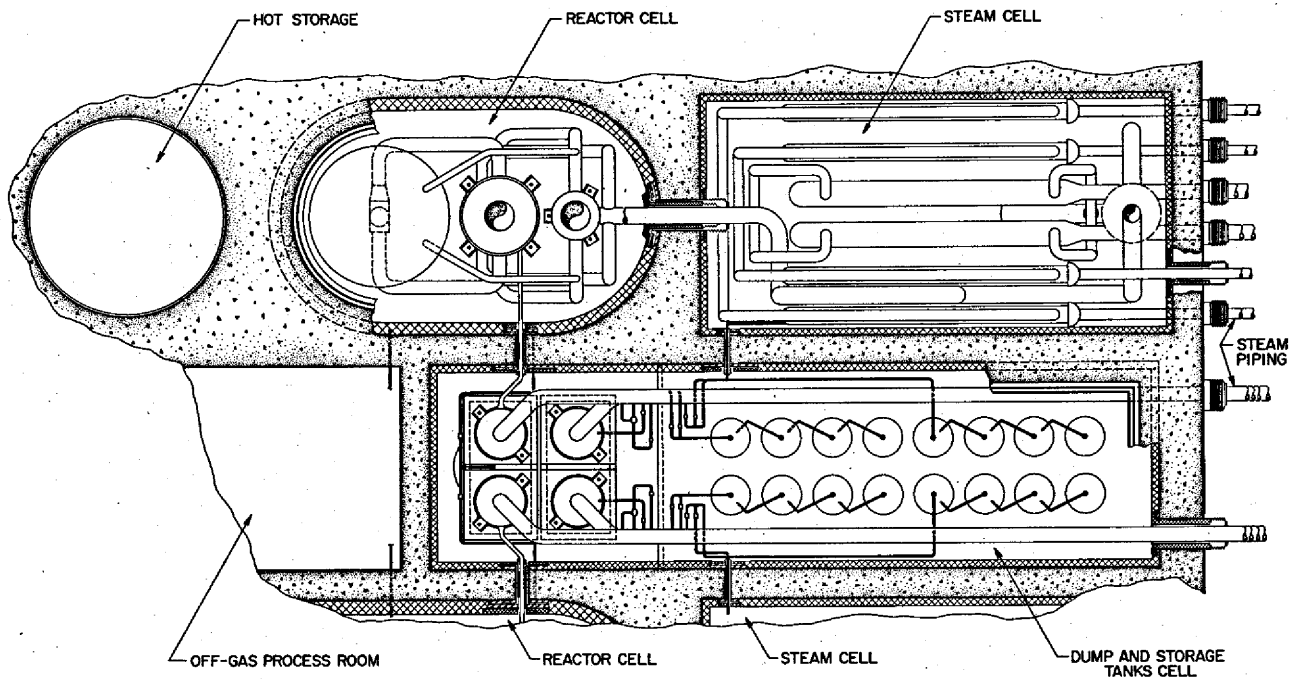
Plan View of Steam Generator and Drain Tank Cells.
